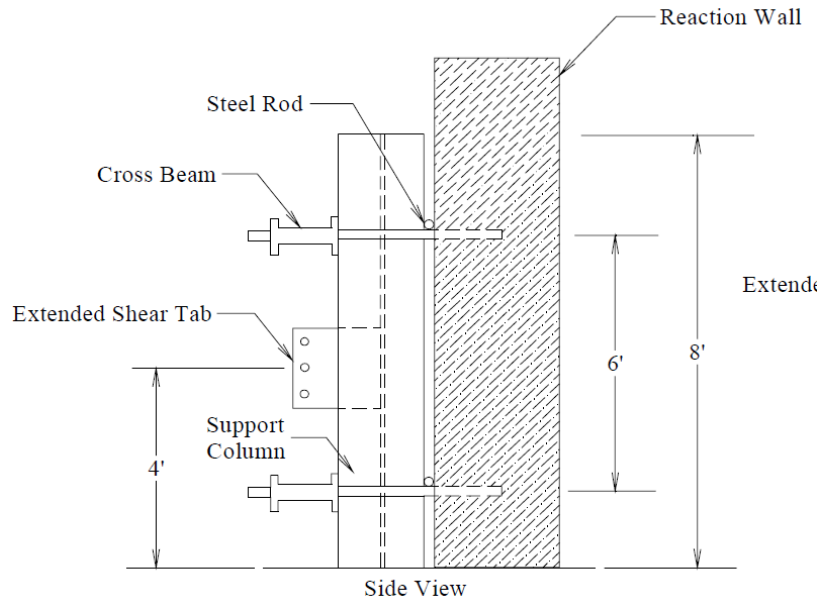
shows the test setup that was used by Sherman and Ghorbanpoor (2002). In this test setup, the far end of the beam was supported by a roller connection as shown in Figure F-2a. The support column was connected to the reaction wall using cross beams and steel rods as shown in Figure F-2b and c.
